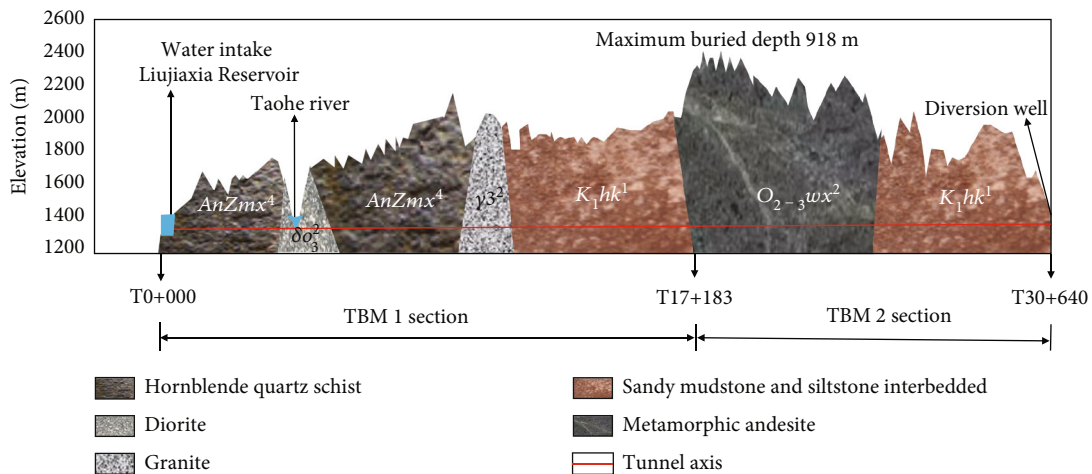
Geological profile of Lanzhou water conveyance tunnel construction project.
